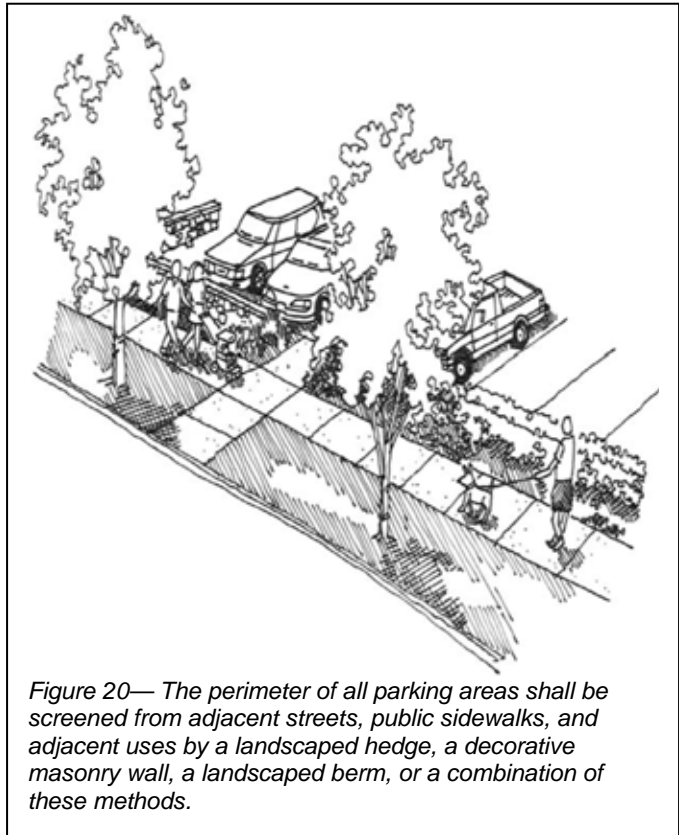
The perimeter of all parking areas shall be screened from adjacent streets, public sidewalks, and adjacent uses by a landscaped hedge, a decorative masonry wall, a landscaped berm, or a combination of these methods.
